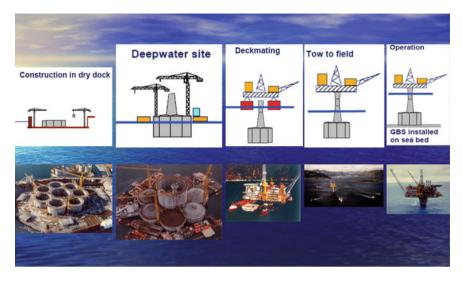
Principles of constructing large marine concrete structures. The Draugen Platform is the example here. First dry dock, so float out and completion before deck mating. The deck is built in parallel with the concrete structure. Finally tow out, installation and production of, in this case, oil
